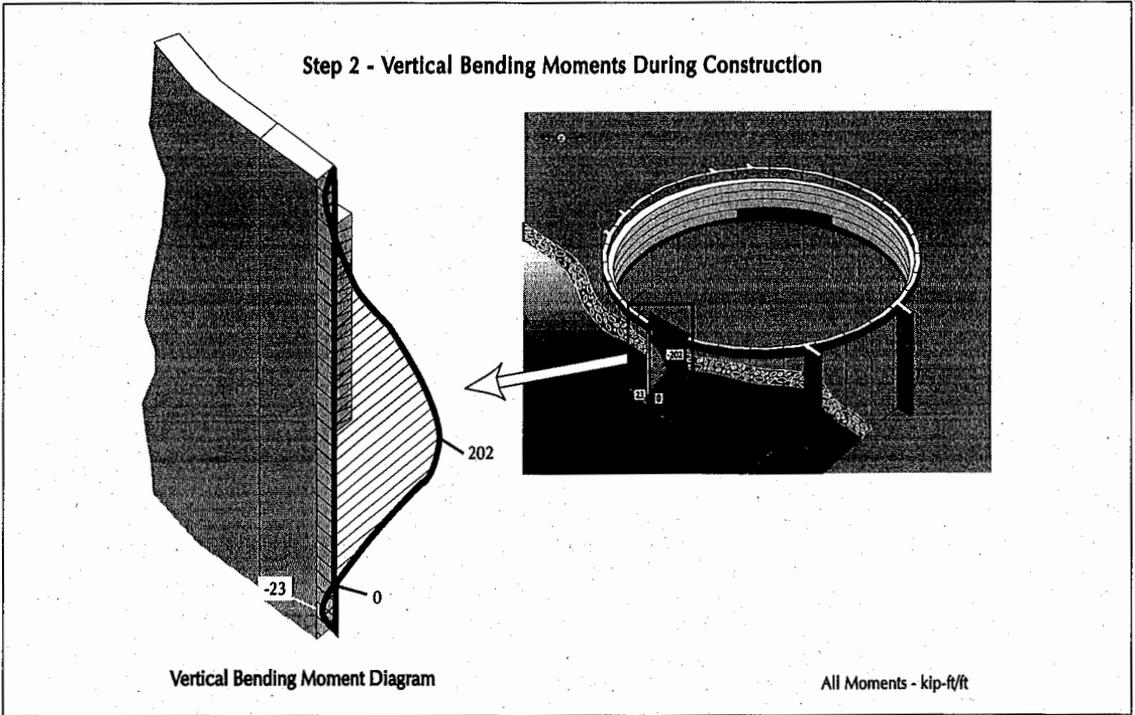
Vertical bending moments for a typical slurry wall panel predicted by analysis during construction Stage IV.
